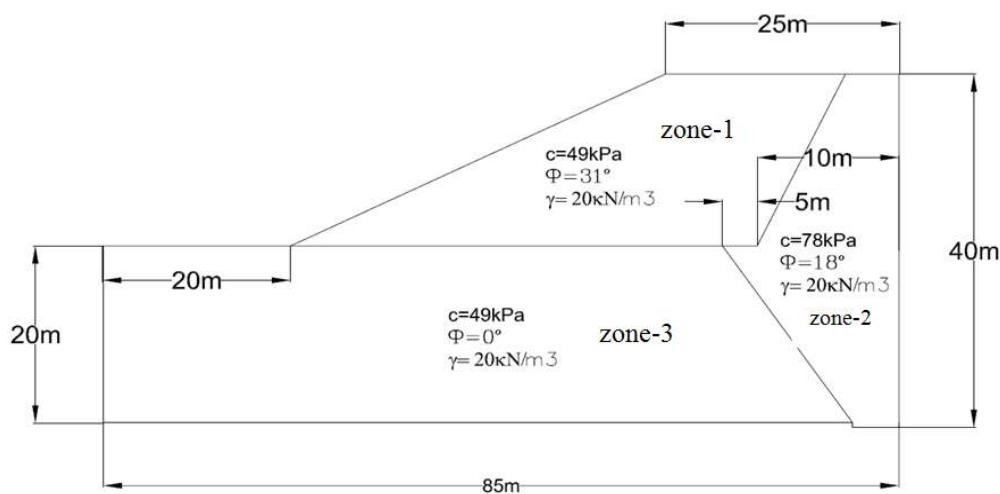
Slope model of Birch Dam in Oklahoma
